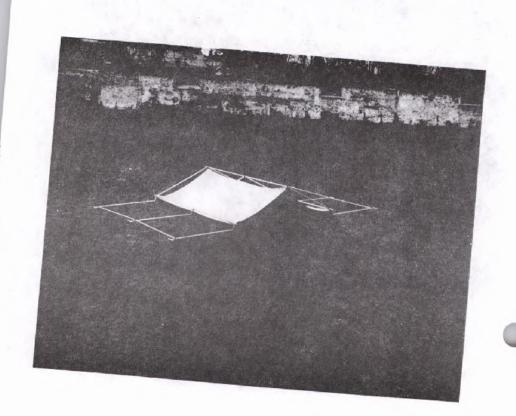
Fit roof liner to the assembled roof frame. Attach tapes to the eave brackets.
